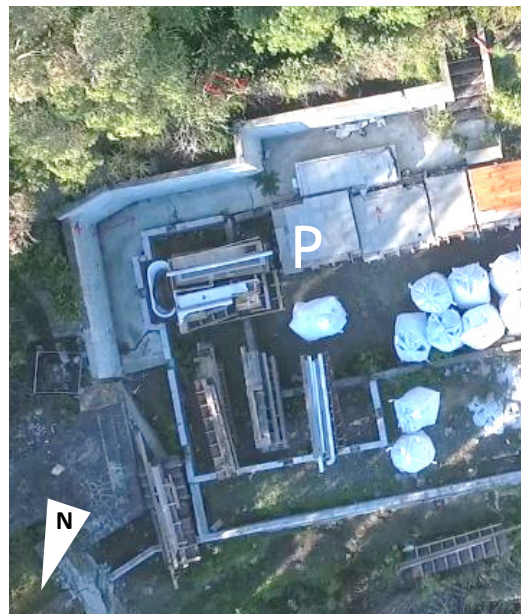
(b). Cracked and displaced reinforced concrete ring foundations and retaining walls on Property A (18/02/2016 Aurecon).
